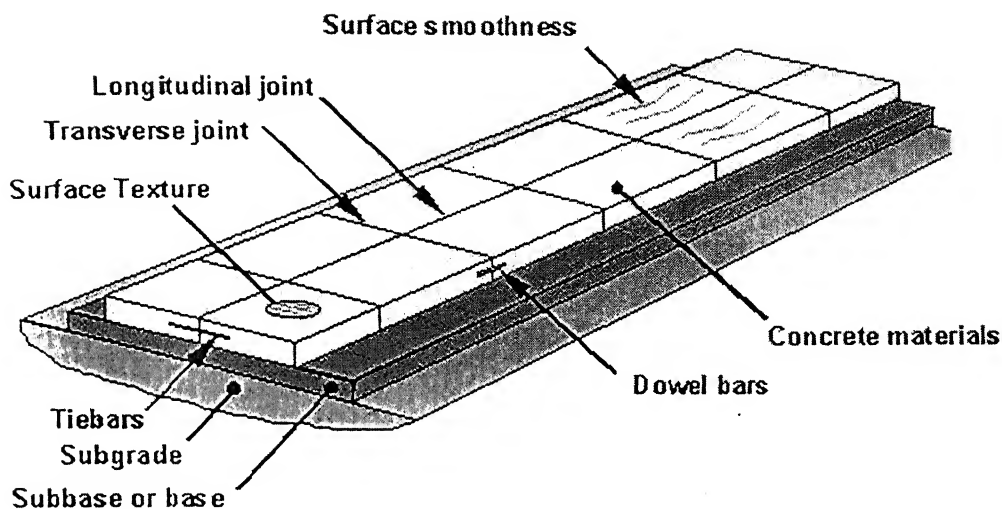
Layout of a concrete pavement (AASHTO, 2002)
